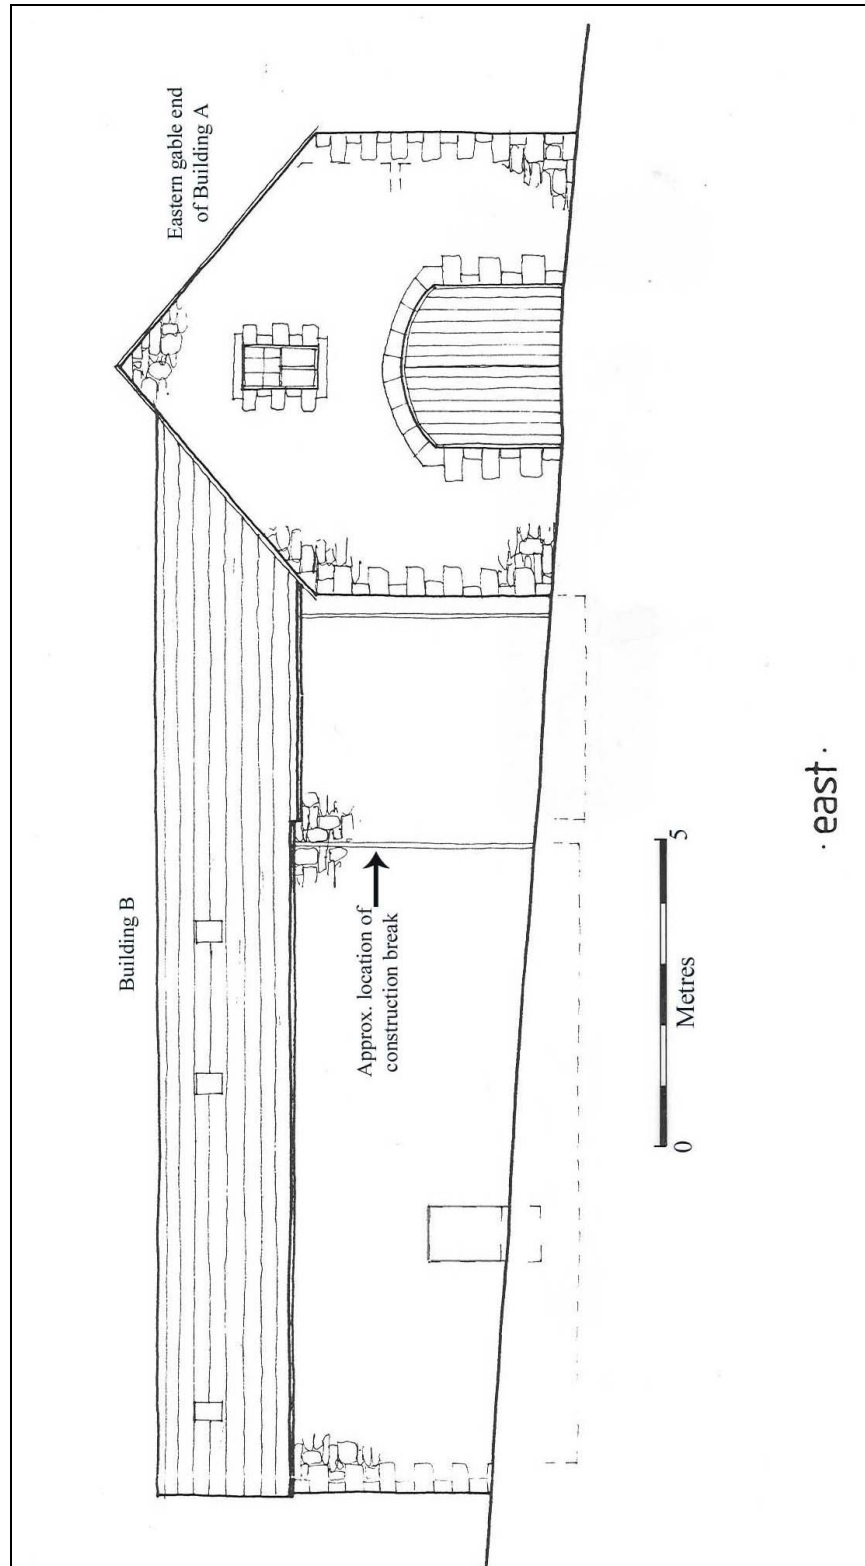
Eastern gable end of Building A and east elevation of Building B
